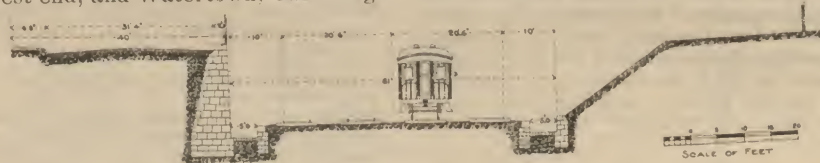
SECTION BETWEEN WASHINGTON AND CENTER STREETS.
